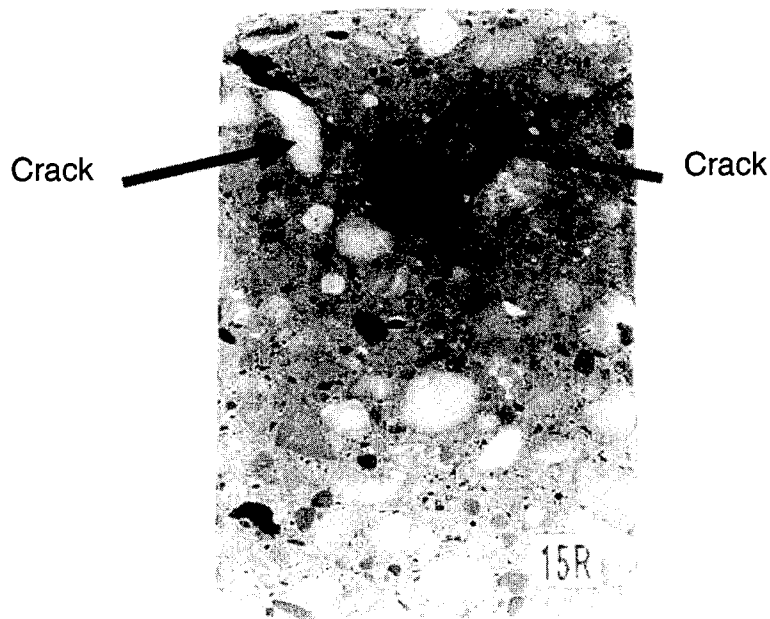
Cross-sectional view of steel bar in slab 15R-B showing cracking in the concrete matrix, but not extending to the slab surface.
